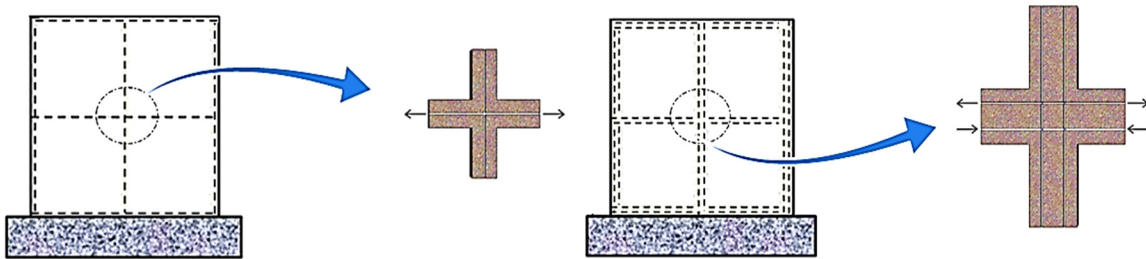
Connection of vertical grouted cells and horizontal bond beams
